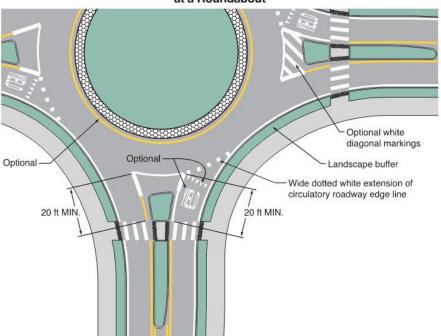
D-2. Example of Markings for a One-Lane Roundabout
